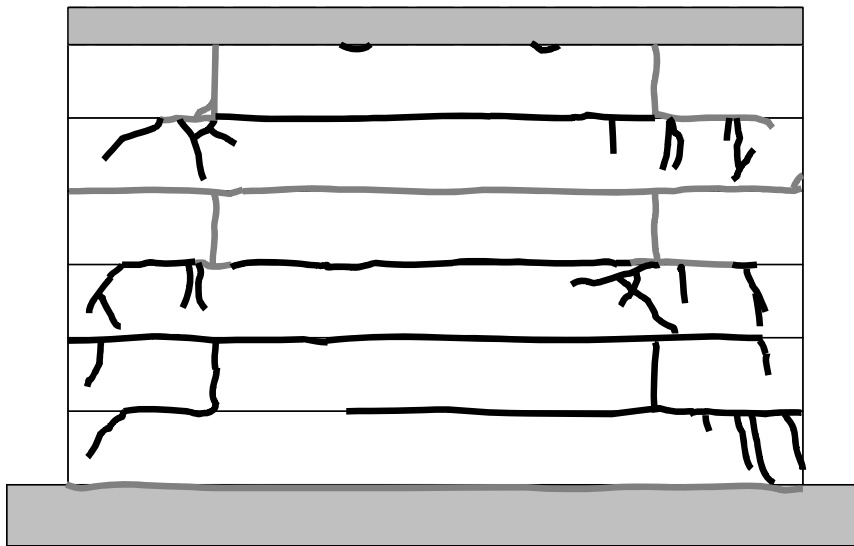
Cracking of Shear Wall Pilot Specimen 1 at Cycle 10a (more cracks in bed joints and head joints, plus local effects)
